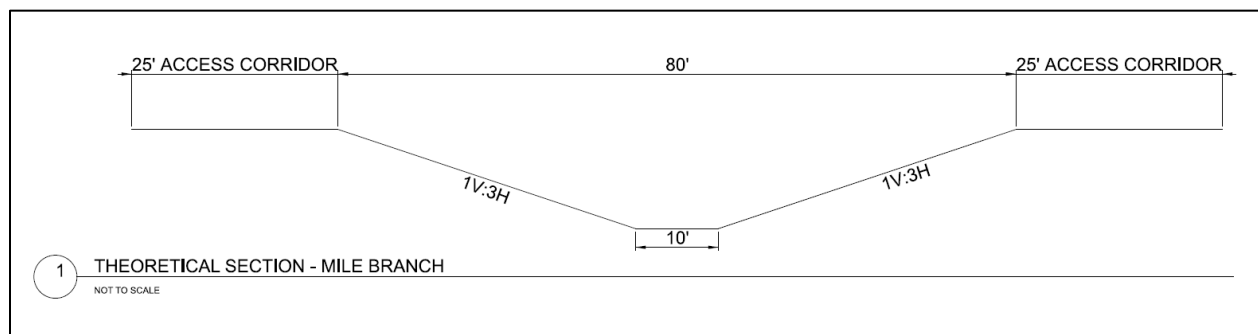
Mile Branch Improvements- Typical Cross-Section
